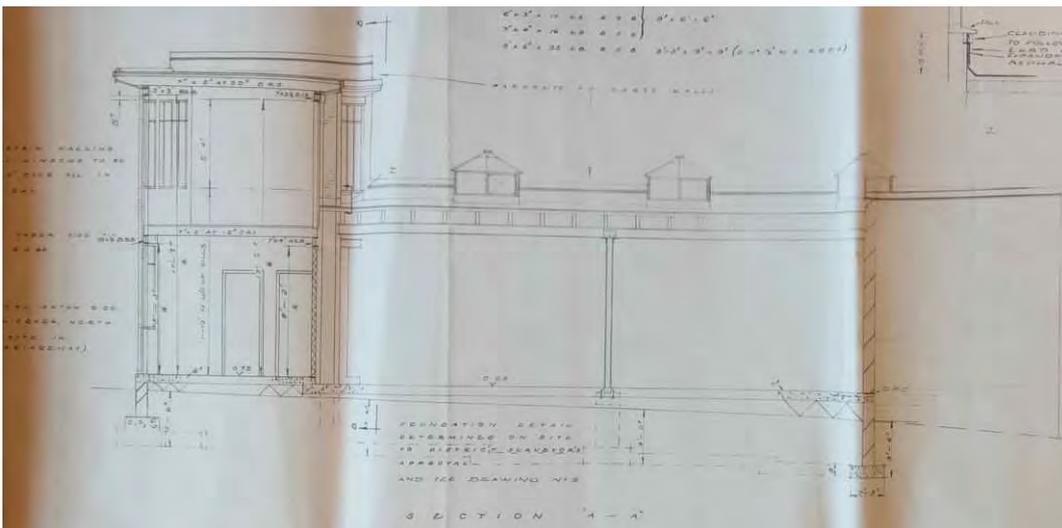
Architect's drawing showing a cross-section of the building at 51-57 Willow Way (LMA ref. GLC/AR/BR/34/003004).
